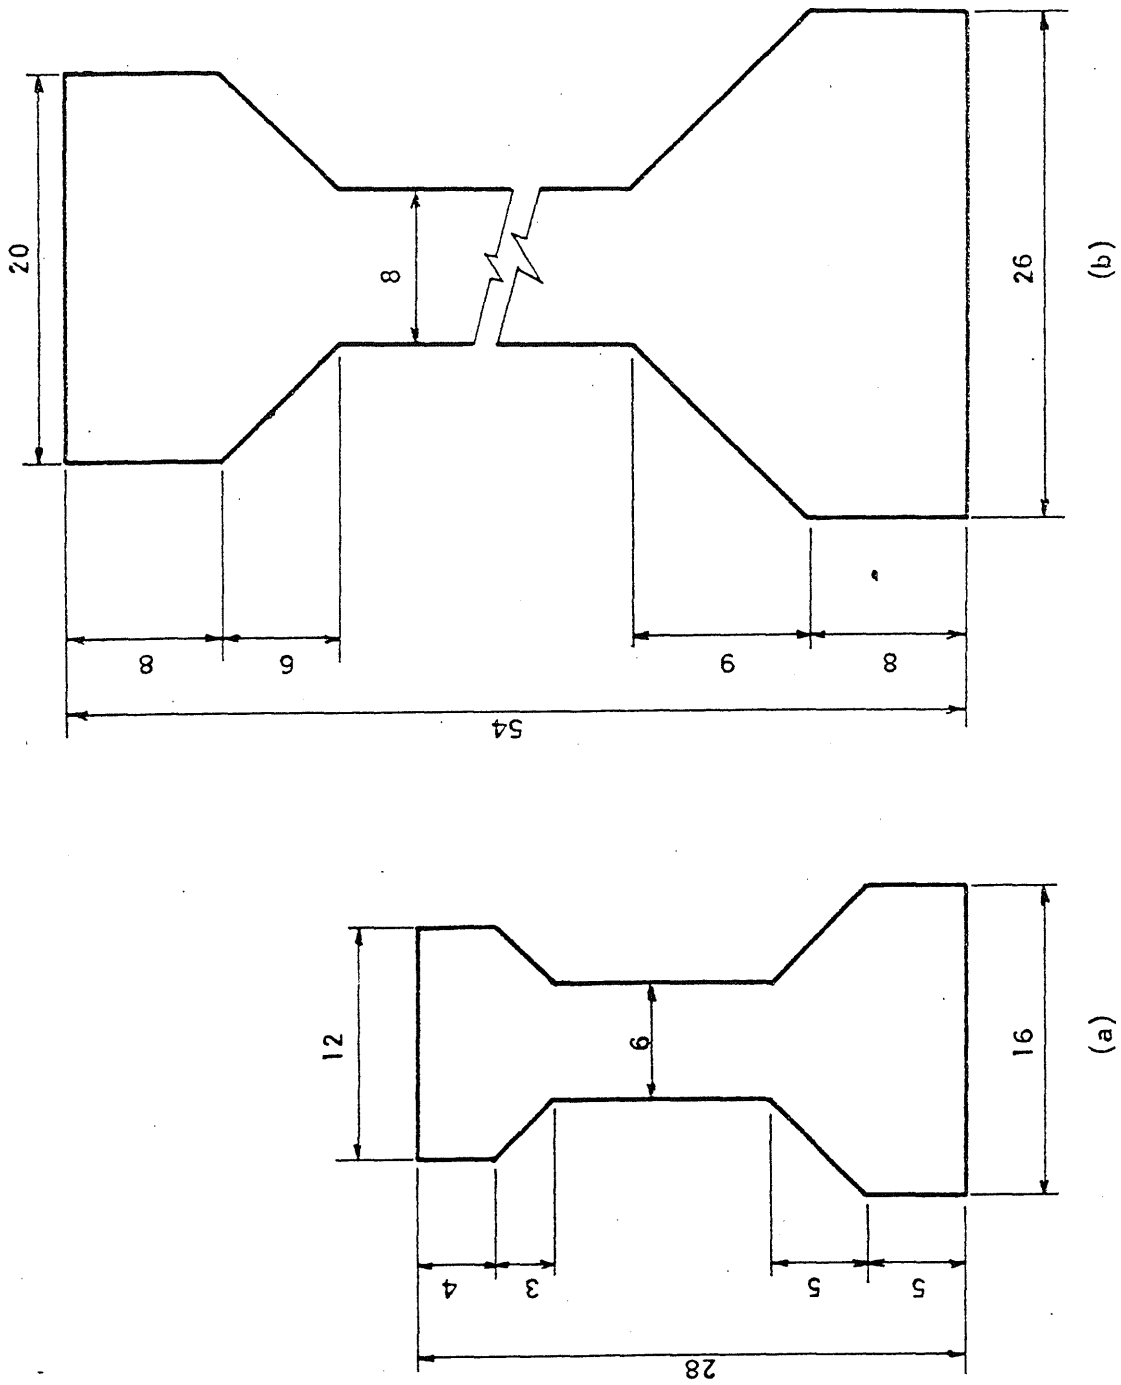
CROSS SECTION OF BEAMS USED IN DESIGN EXAMPLES
